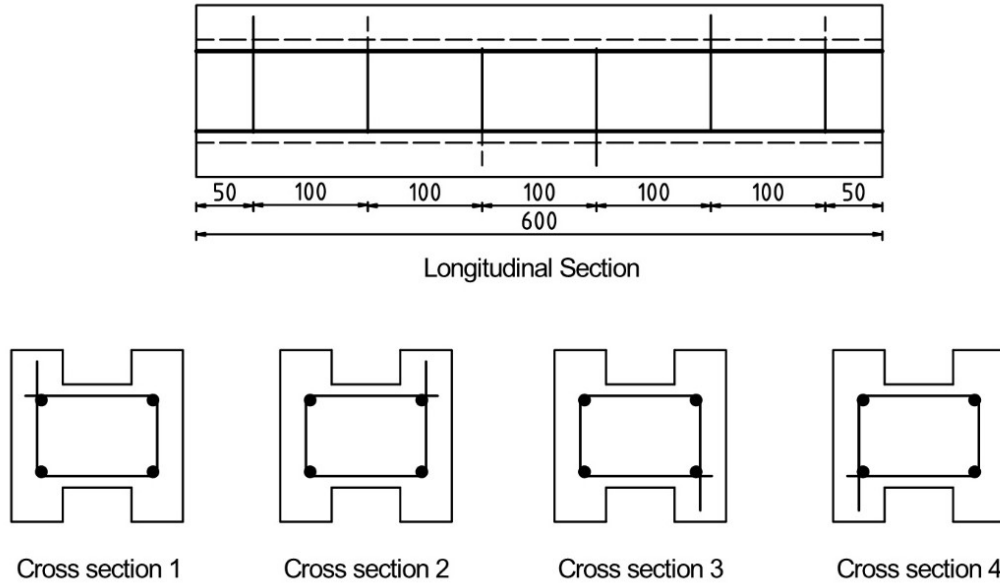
Reinforcement stud arrangement in Type C H-posts (all dimensions are in mm)
